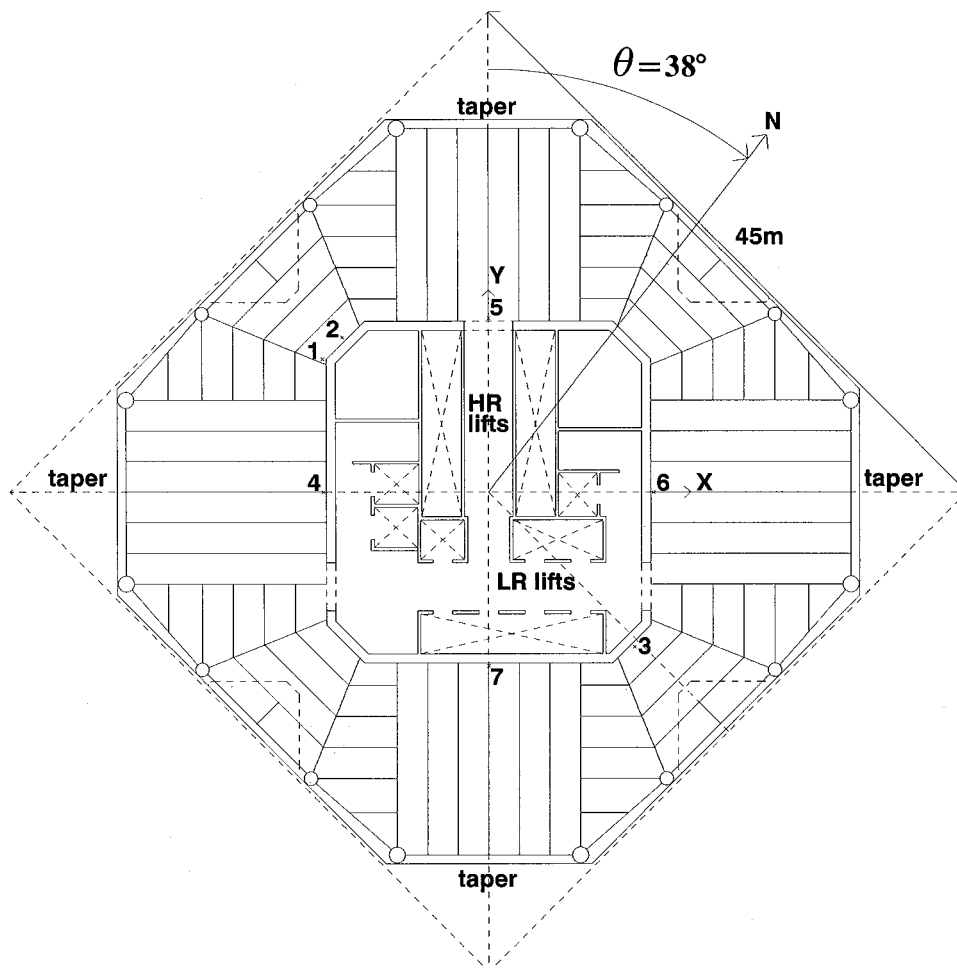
Floor plan at level 18 showing X- and Y-direction and AVT measurement locations to determine vertical and horizontal distribution of mode shapes.
